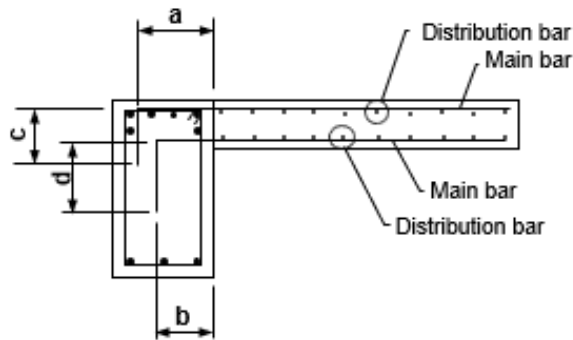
Anchoring of Main bar of Cantilever Slab
